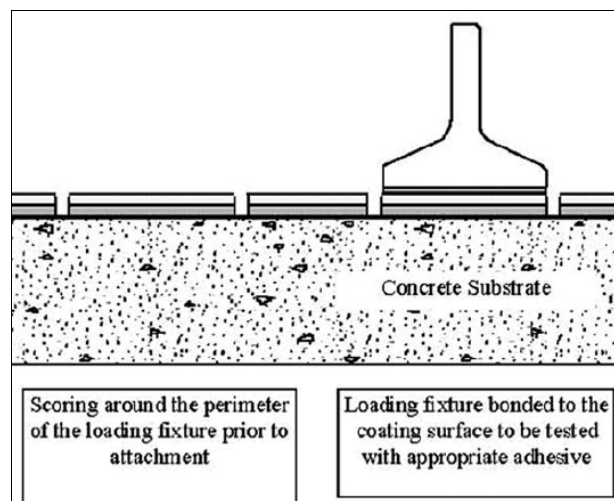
Tensile Bond Specimen Layout (ASTM D7234)
